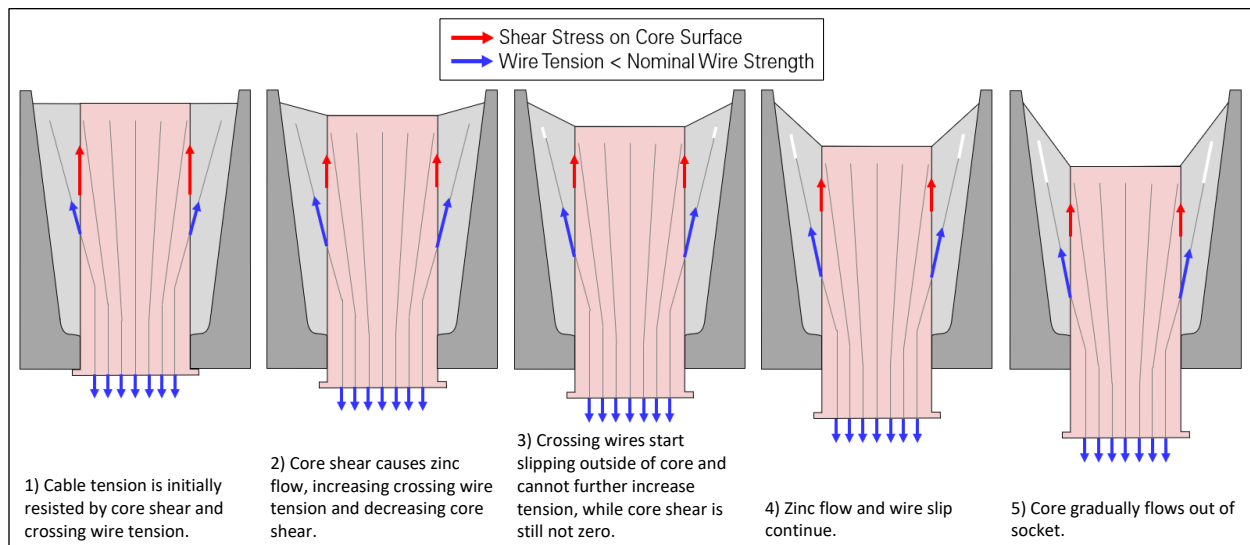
Core flow-out in socket where crossing wires cannot resist full cable tension and are partially developed.
